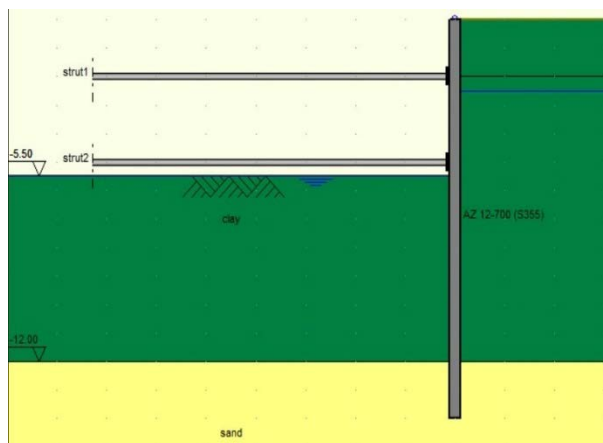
Installation of the second strut to enhance stability in conventional design.
